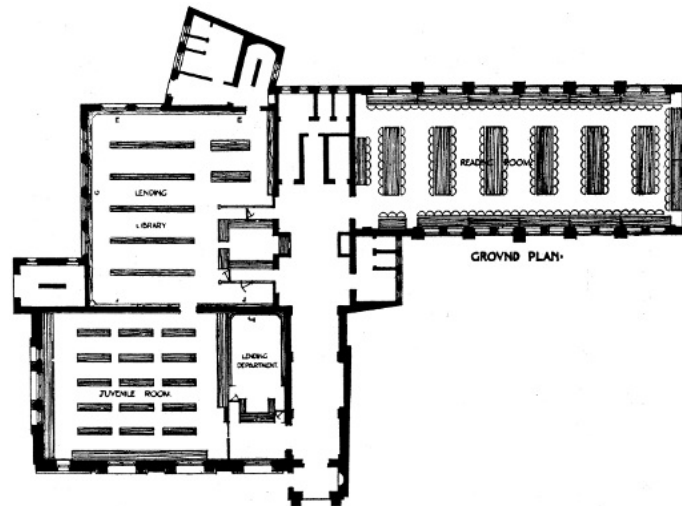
Islington Central Library. Ground Floor Plan (Section 121).
